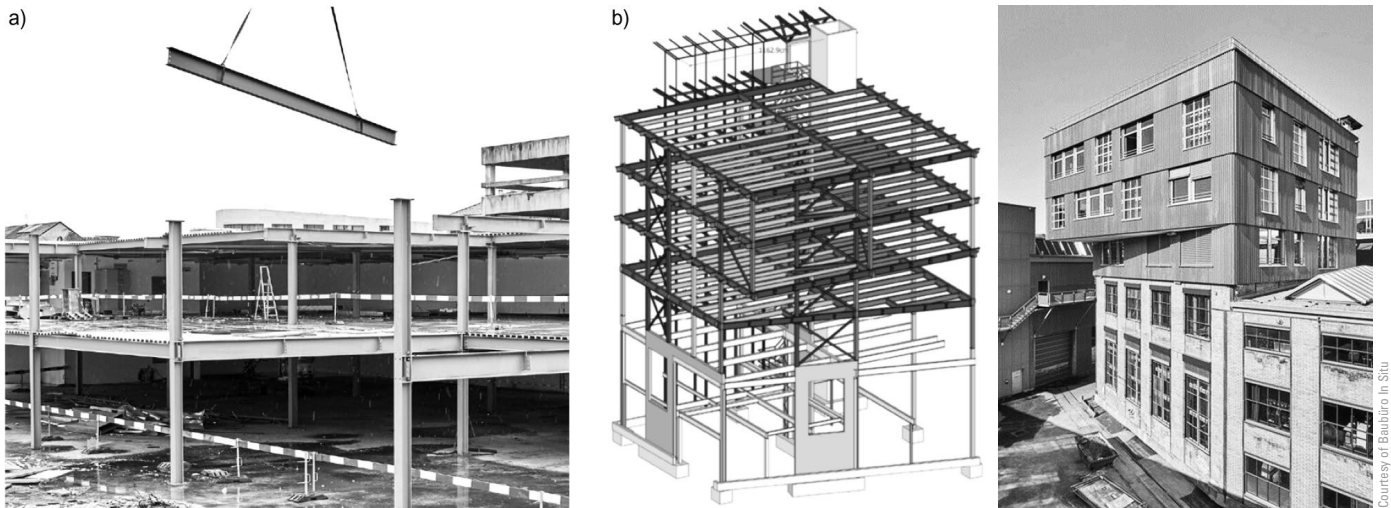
Reuse of steel beams and columns from a discarded distribution centre (a) to the extension of an office building in Winterthur, by architecture firm Baubüro In Situ, completed in 2021 (b)
